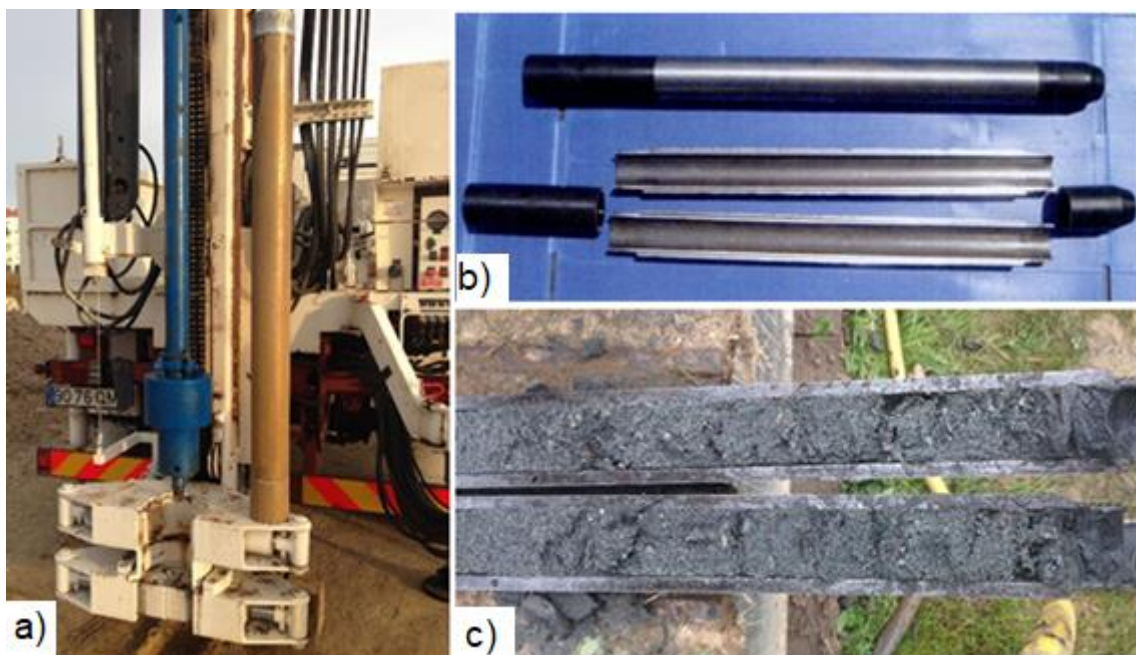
SPT equipment: a) slide hammer; b) steel sampler; c) sample collected
